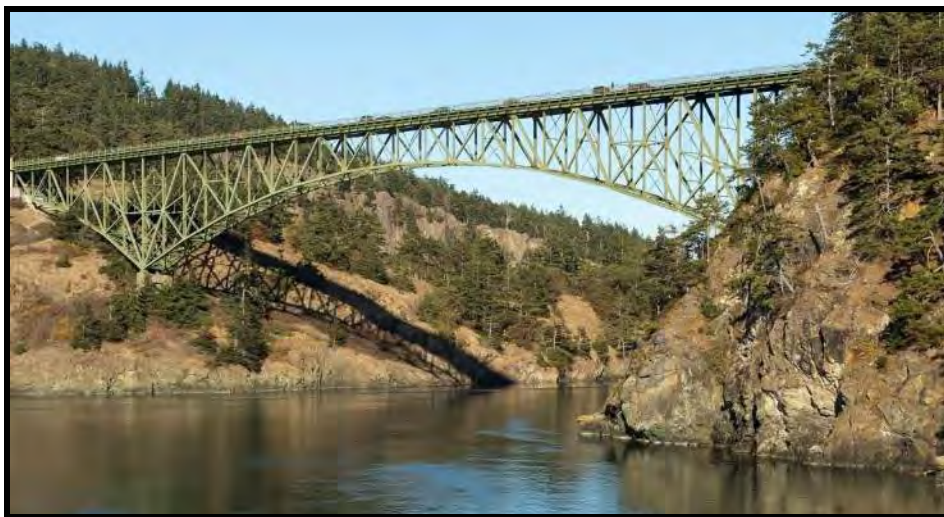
Deception Pass Bridge Whidbey Island, Washington. Steel Deck Truss
